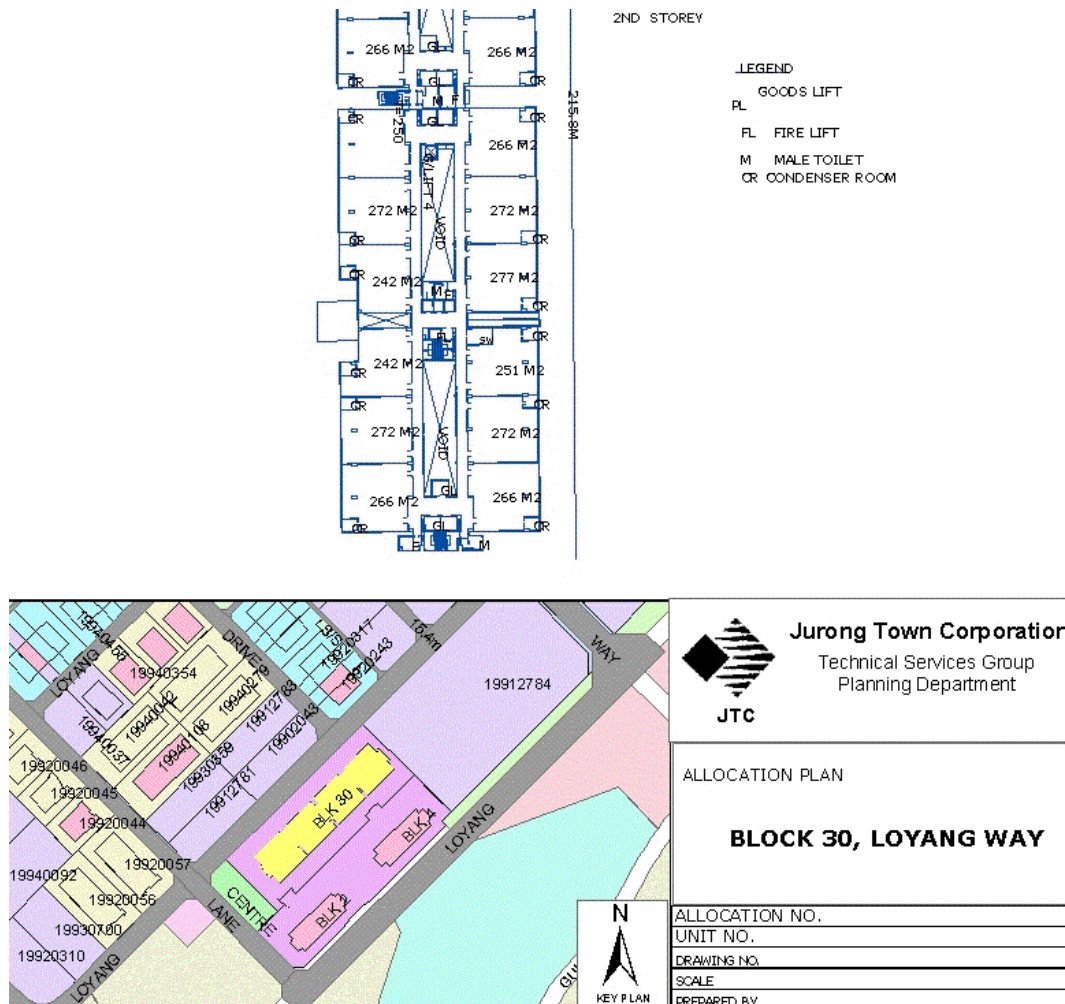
A3 size print of the floor plan for the reserved plot.
